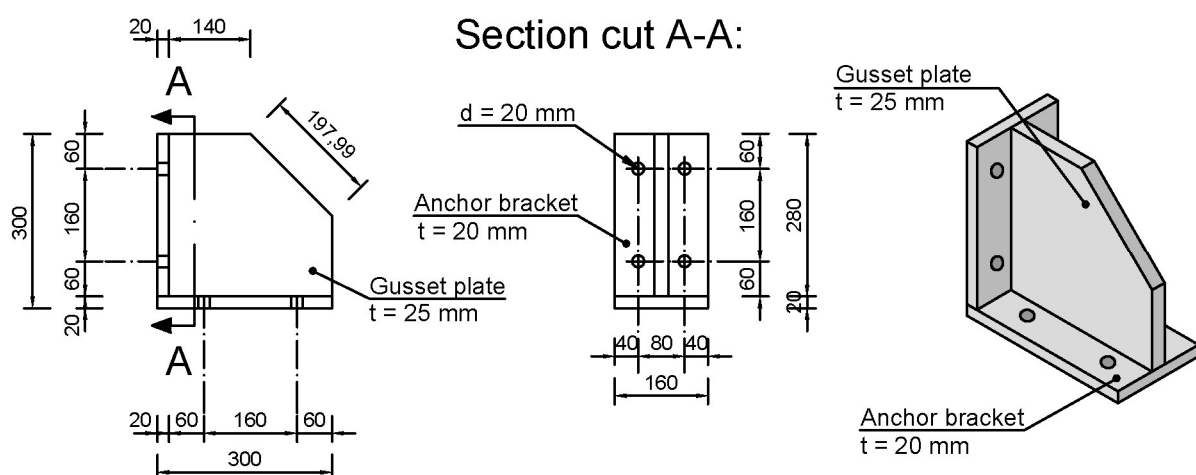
Dimensions of the bracket-to-gusset plate connection element comprising the anchor bracket and the gusset plate. (Note: All dimensions are in mm).
